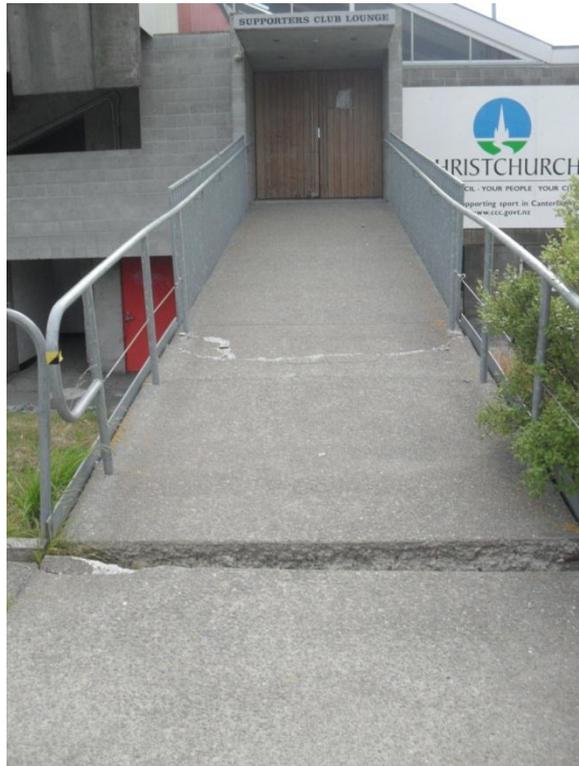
Separation of the seating between the concrete beams supporting the grandstand and the southern concrete steps.
